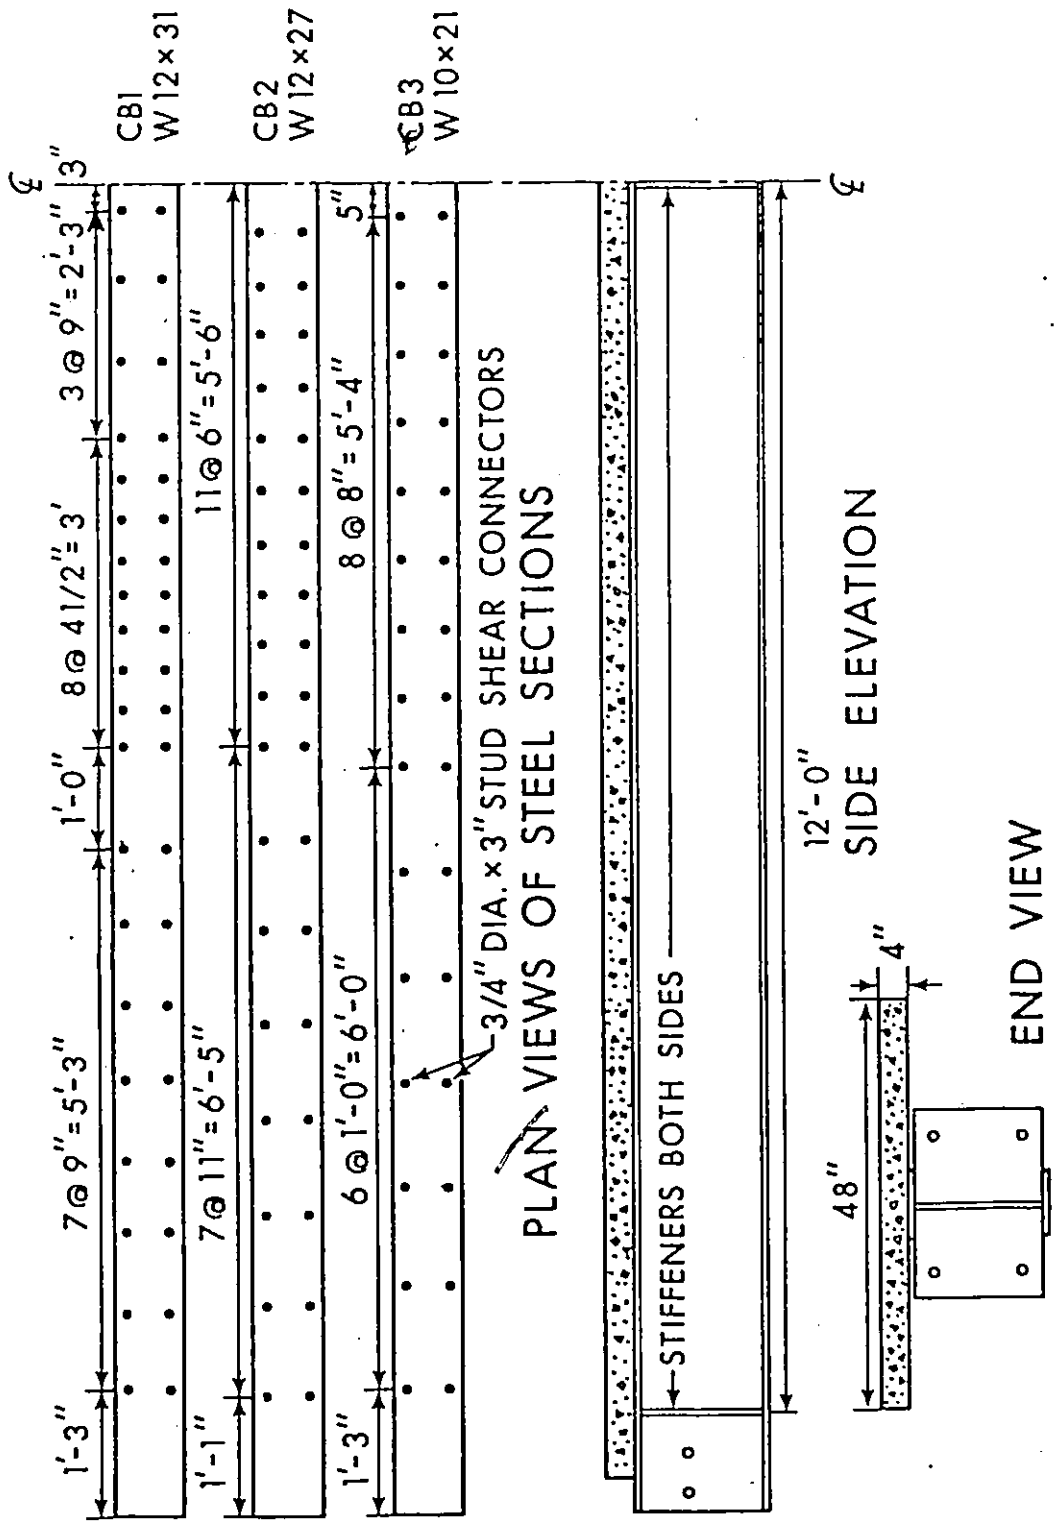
DETAILS OF TEST SPECIMENS
